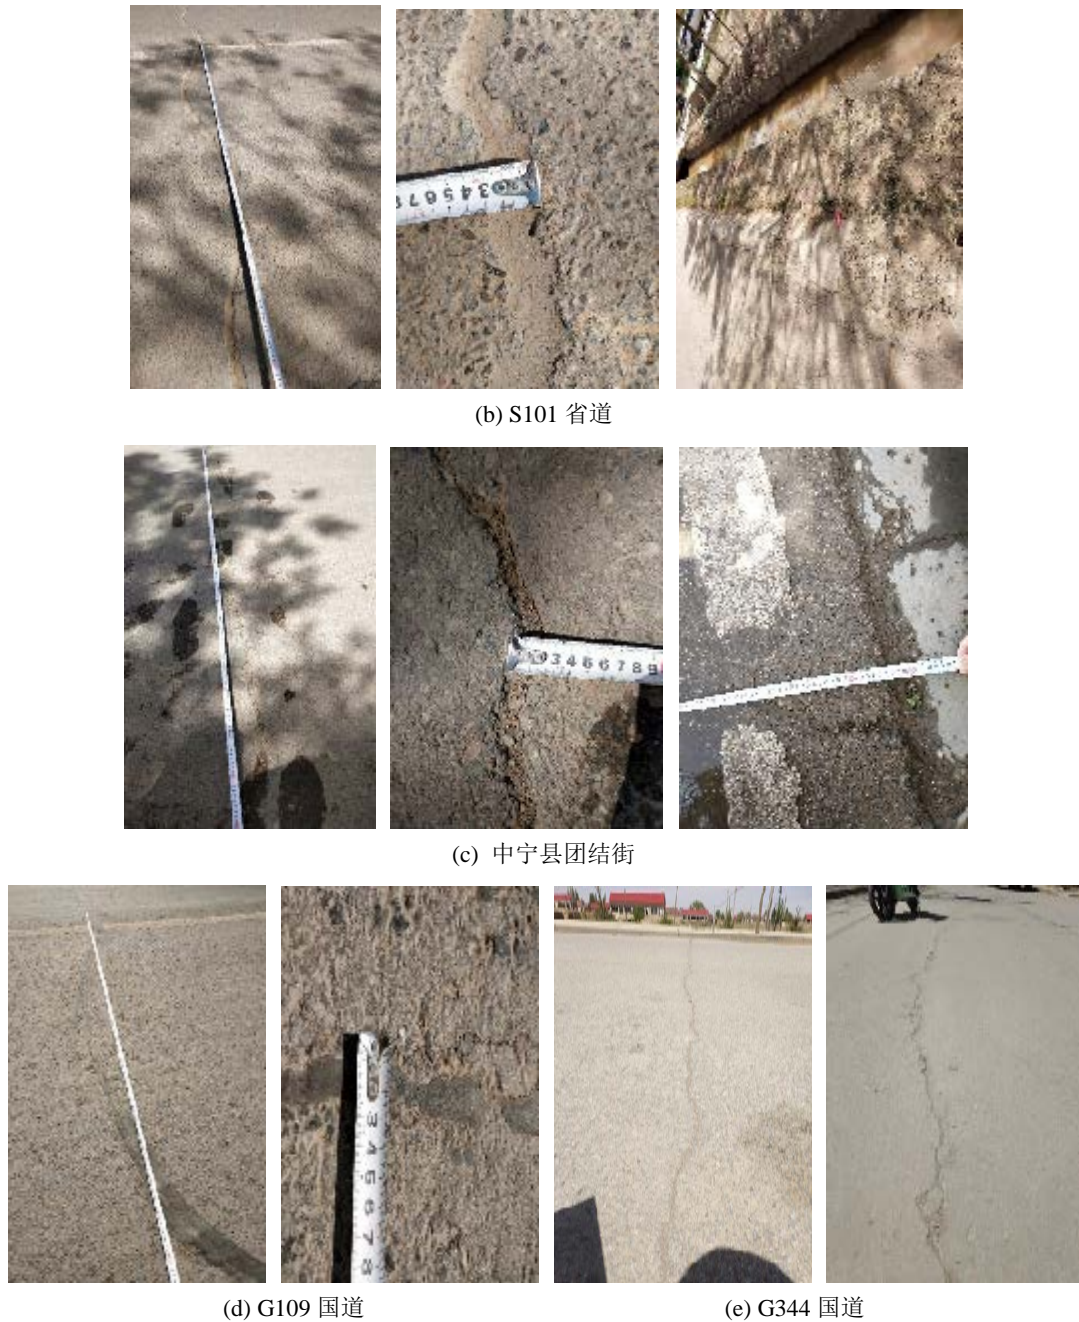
Typical section of pavement damage in Zhongwei
